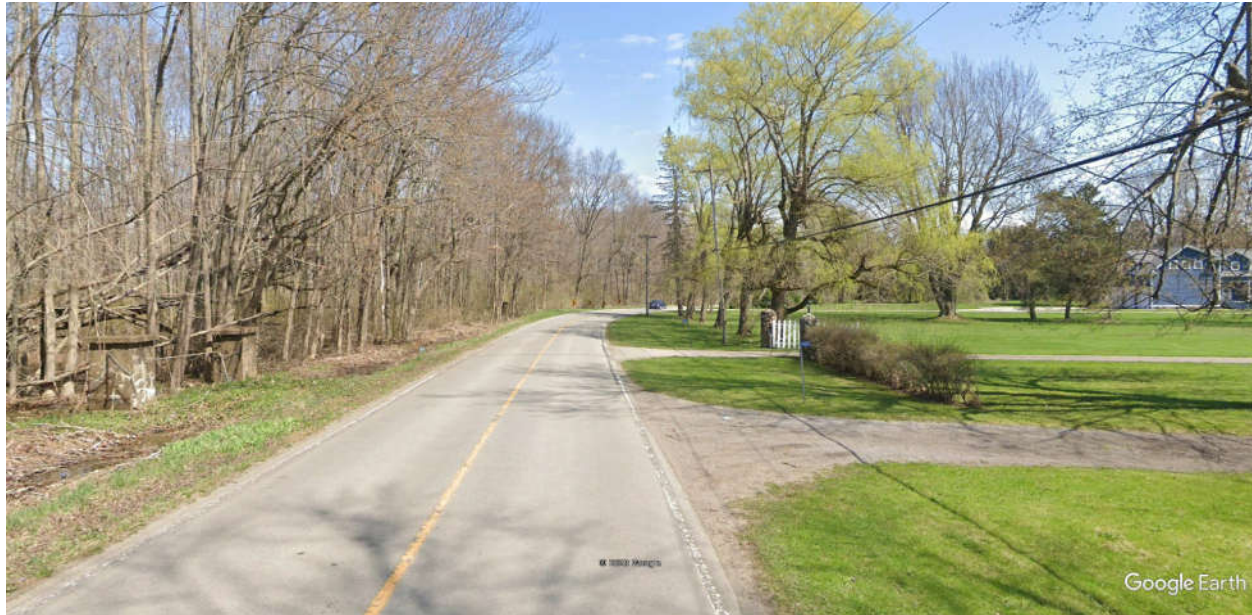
Looking East towards curve beginning at 4409 Erie Road.
